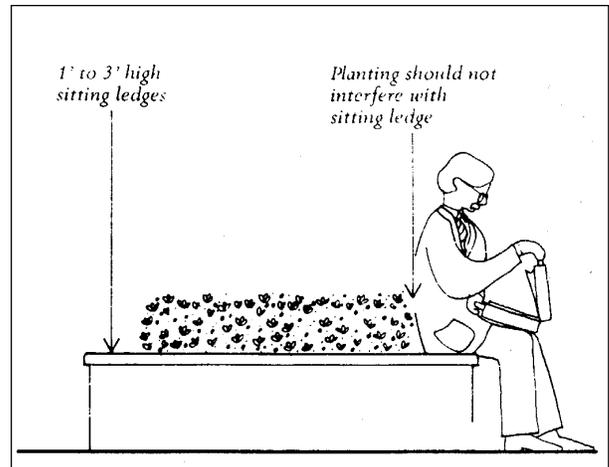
Fixed Planters – Side Elevation of Raised Planting Area with Seating
